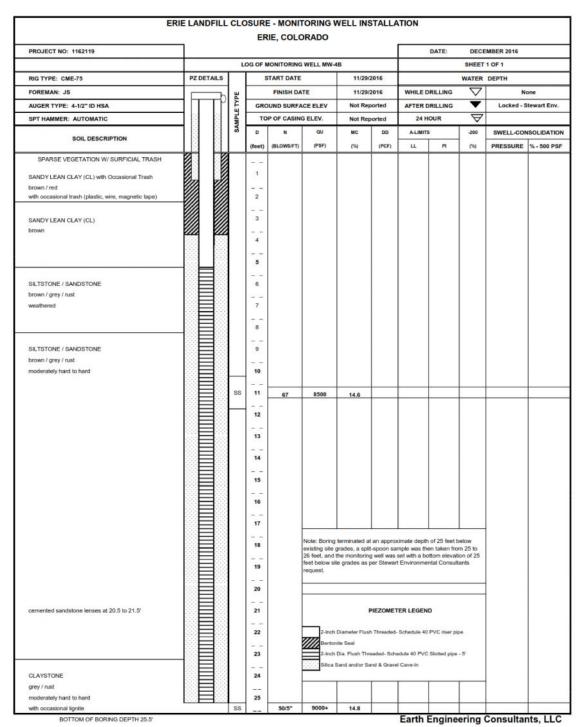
Earth Engineering Test Boring SEC MW-4
